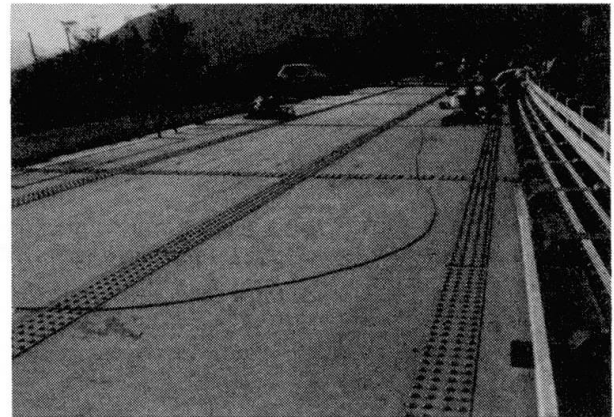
Replacement works of damaged RC decks to prefabricated steel bridge deck
